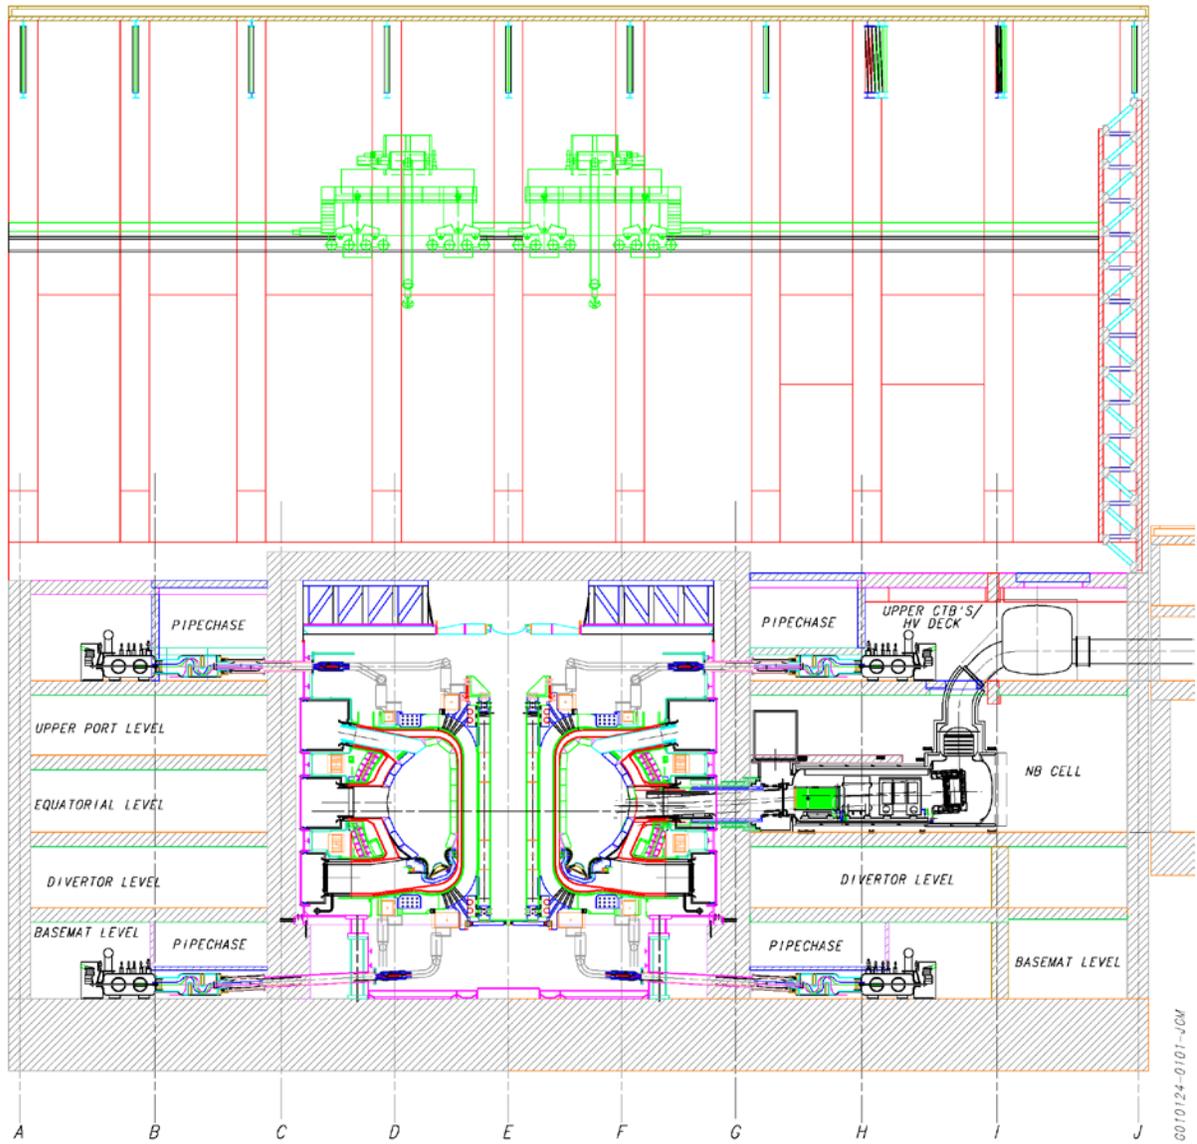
Cross-section EW Through the Tokamak Building
